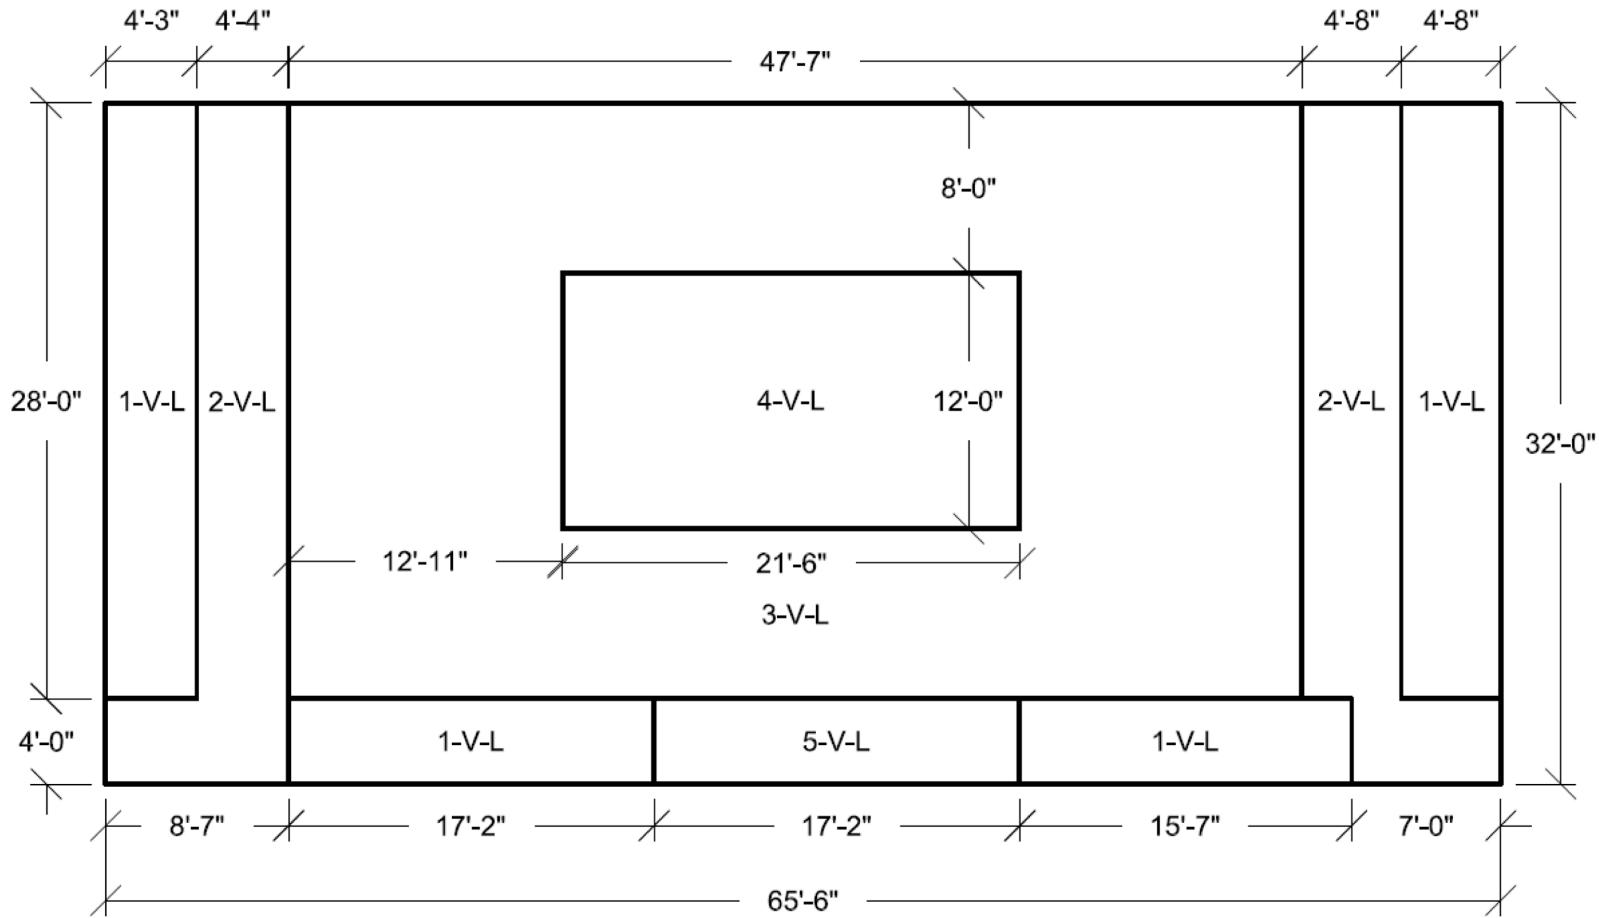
H.6-163 DGFOSV Wall 7 Looking From Outside Horizontal Reinforcement Zones Near Side Face
